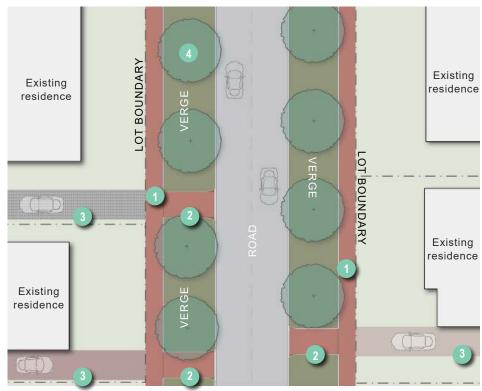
Typical Woodside Precinct streetscape illustrating proposed footpath and crossover materials.
